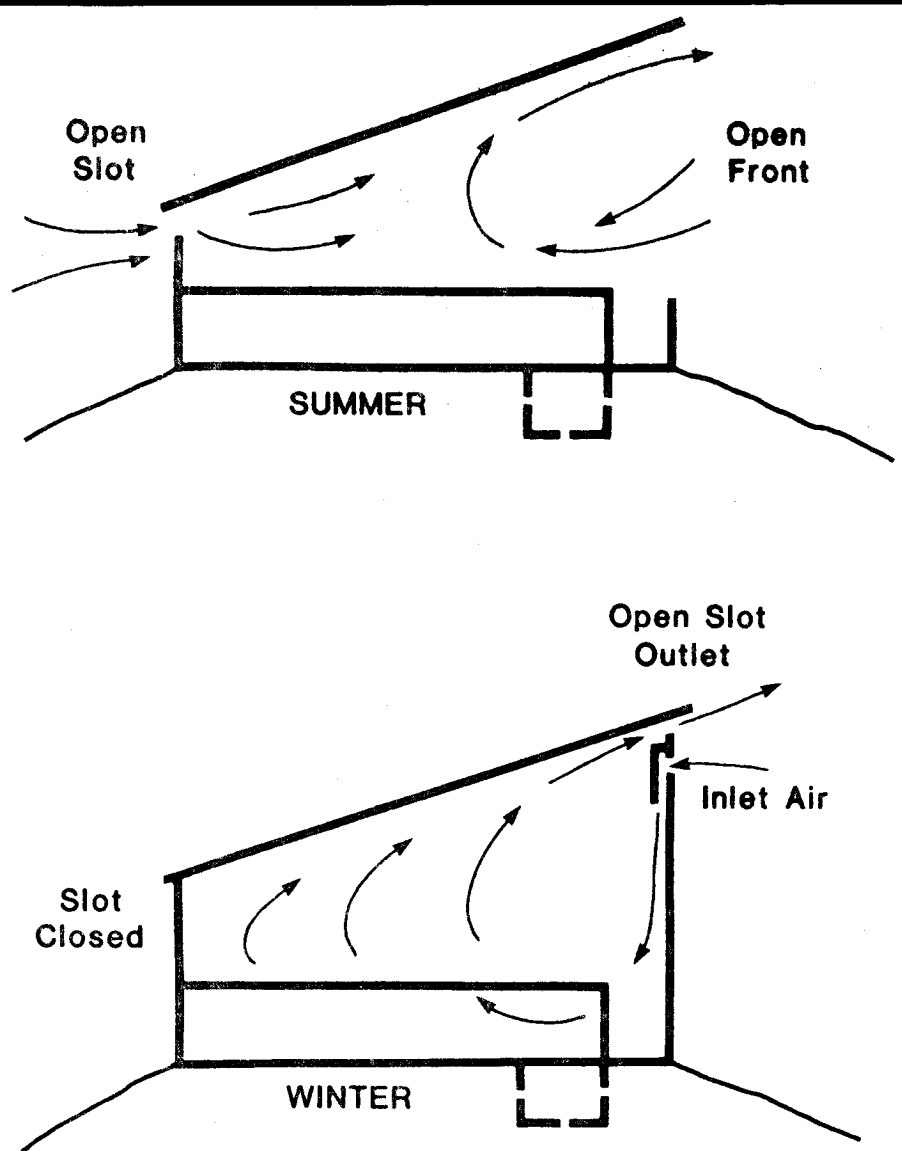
Air flow patterns in a naturally ventilated single slope roof building.
